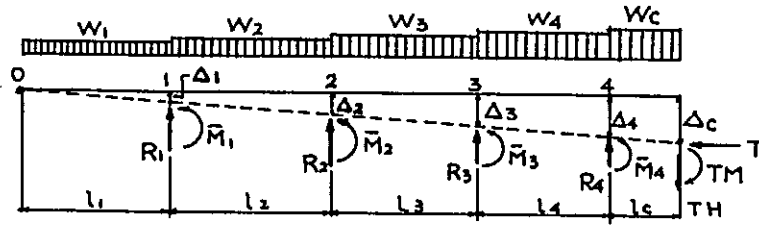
FOUR-SPAN TOWER WITH CANTILEVER
